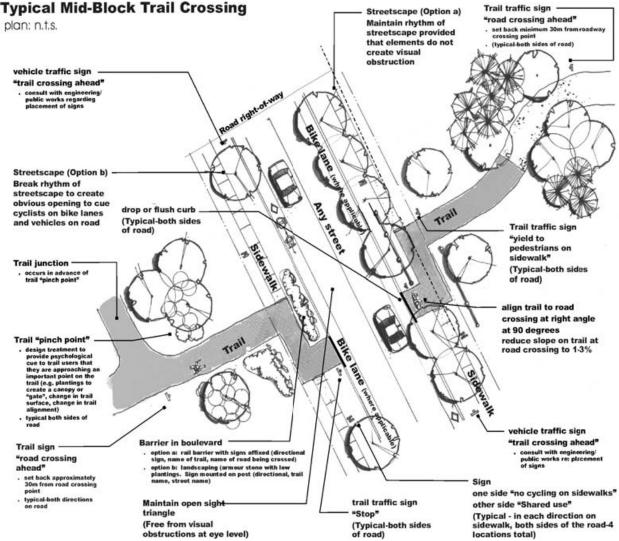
Elements of Multi-Use Trail Crossings of Roadways trail traffic sign vehicle traffic sign "trail crossing ahead" "stop" consult with engineering/ public works re: placement of signs sign existing ditch/ swale "no cycling on sidewalks" trail barriers to allow free access for permitted uses, to restrict access for non-permitted uses setback from road edge should be min. 6-8m to stop a service vehicle while opening gate traffic sign-"road crossing ahead" set back minimum 30m from roadway crossing 6.0.8.0m use plant massing as an alternative to fencing to delineate property boundaries align trail to road crossing reduce slope on trail at road crossing to 1-3% adjacent private property "no cycling on sidewalks" vehicle traffic sign "trail crossing ahead" setback from crossing point dependent on design for road/street and sight lines. Consult with municipal engineering/public works for setback details potential connection with on-road routes e.g. bike lanes (where applicable) trail traffic sign trail barriers -"stop" to allow free access for permitted uses, to restrict access for non-permitted uses
